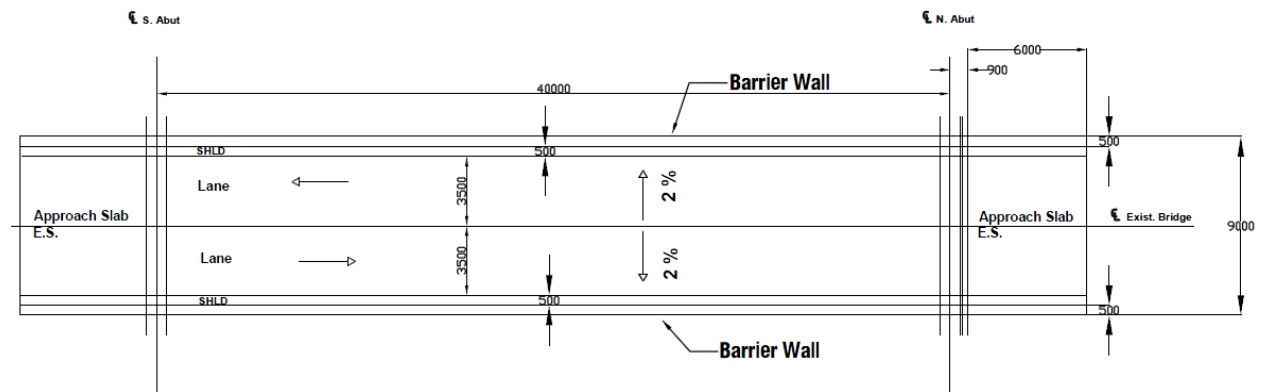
Plan view of the existing bridge (dimensions are in mm)
